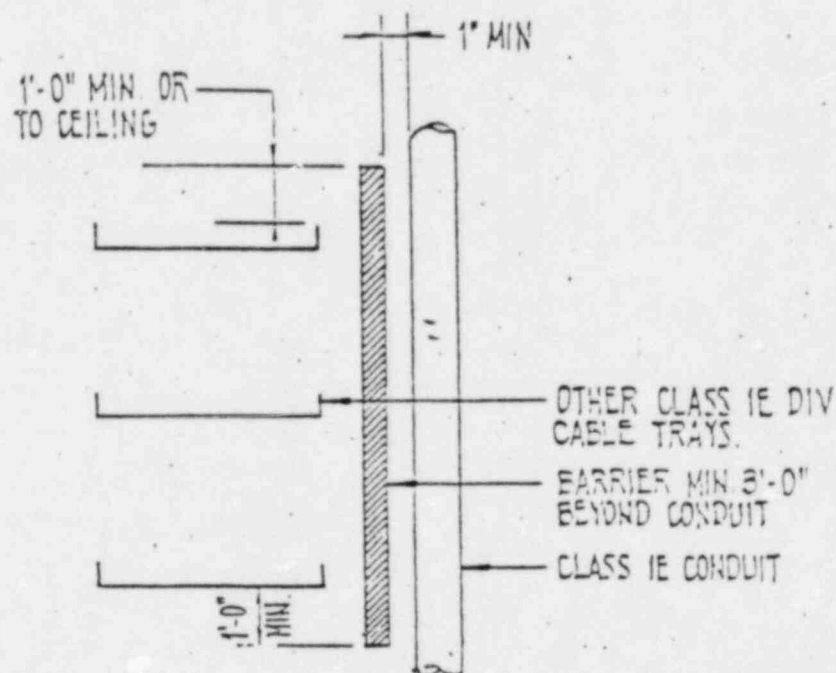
ARRANGEMENT FOR VERTICAL SAFETY CONDUITS
